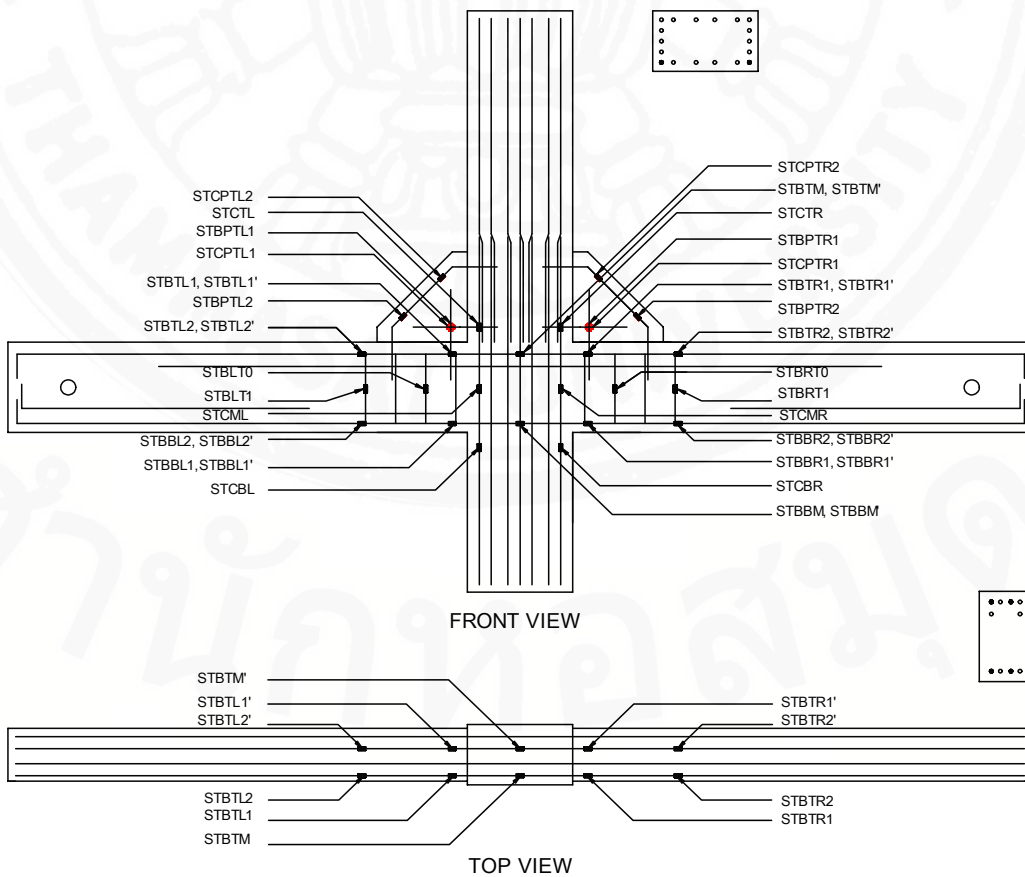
Position of strain gages on longitudinal and transverse bar of specimen PJE4
